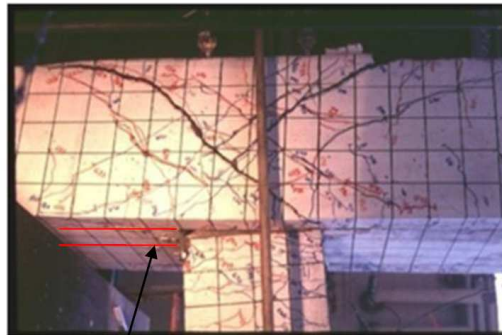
Example of Reinforcing Bar Slip Due to Bond Failure [137]
